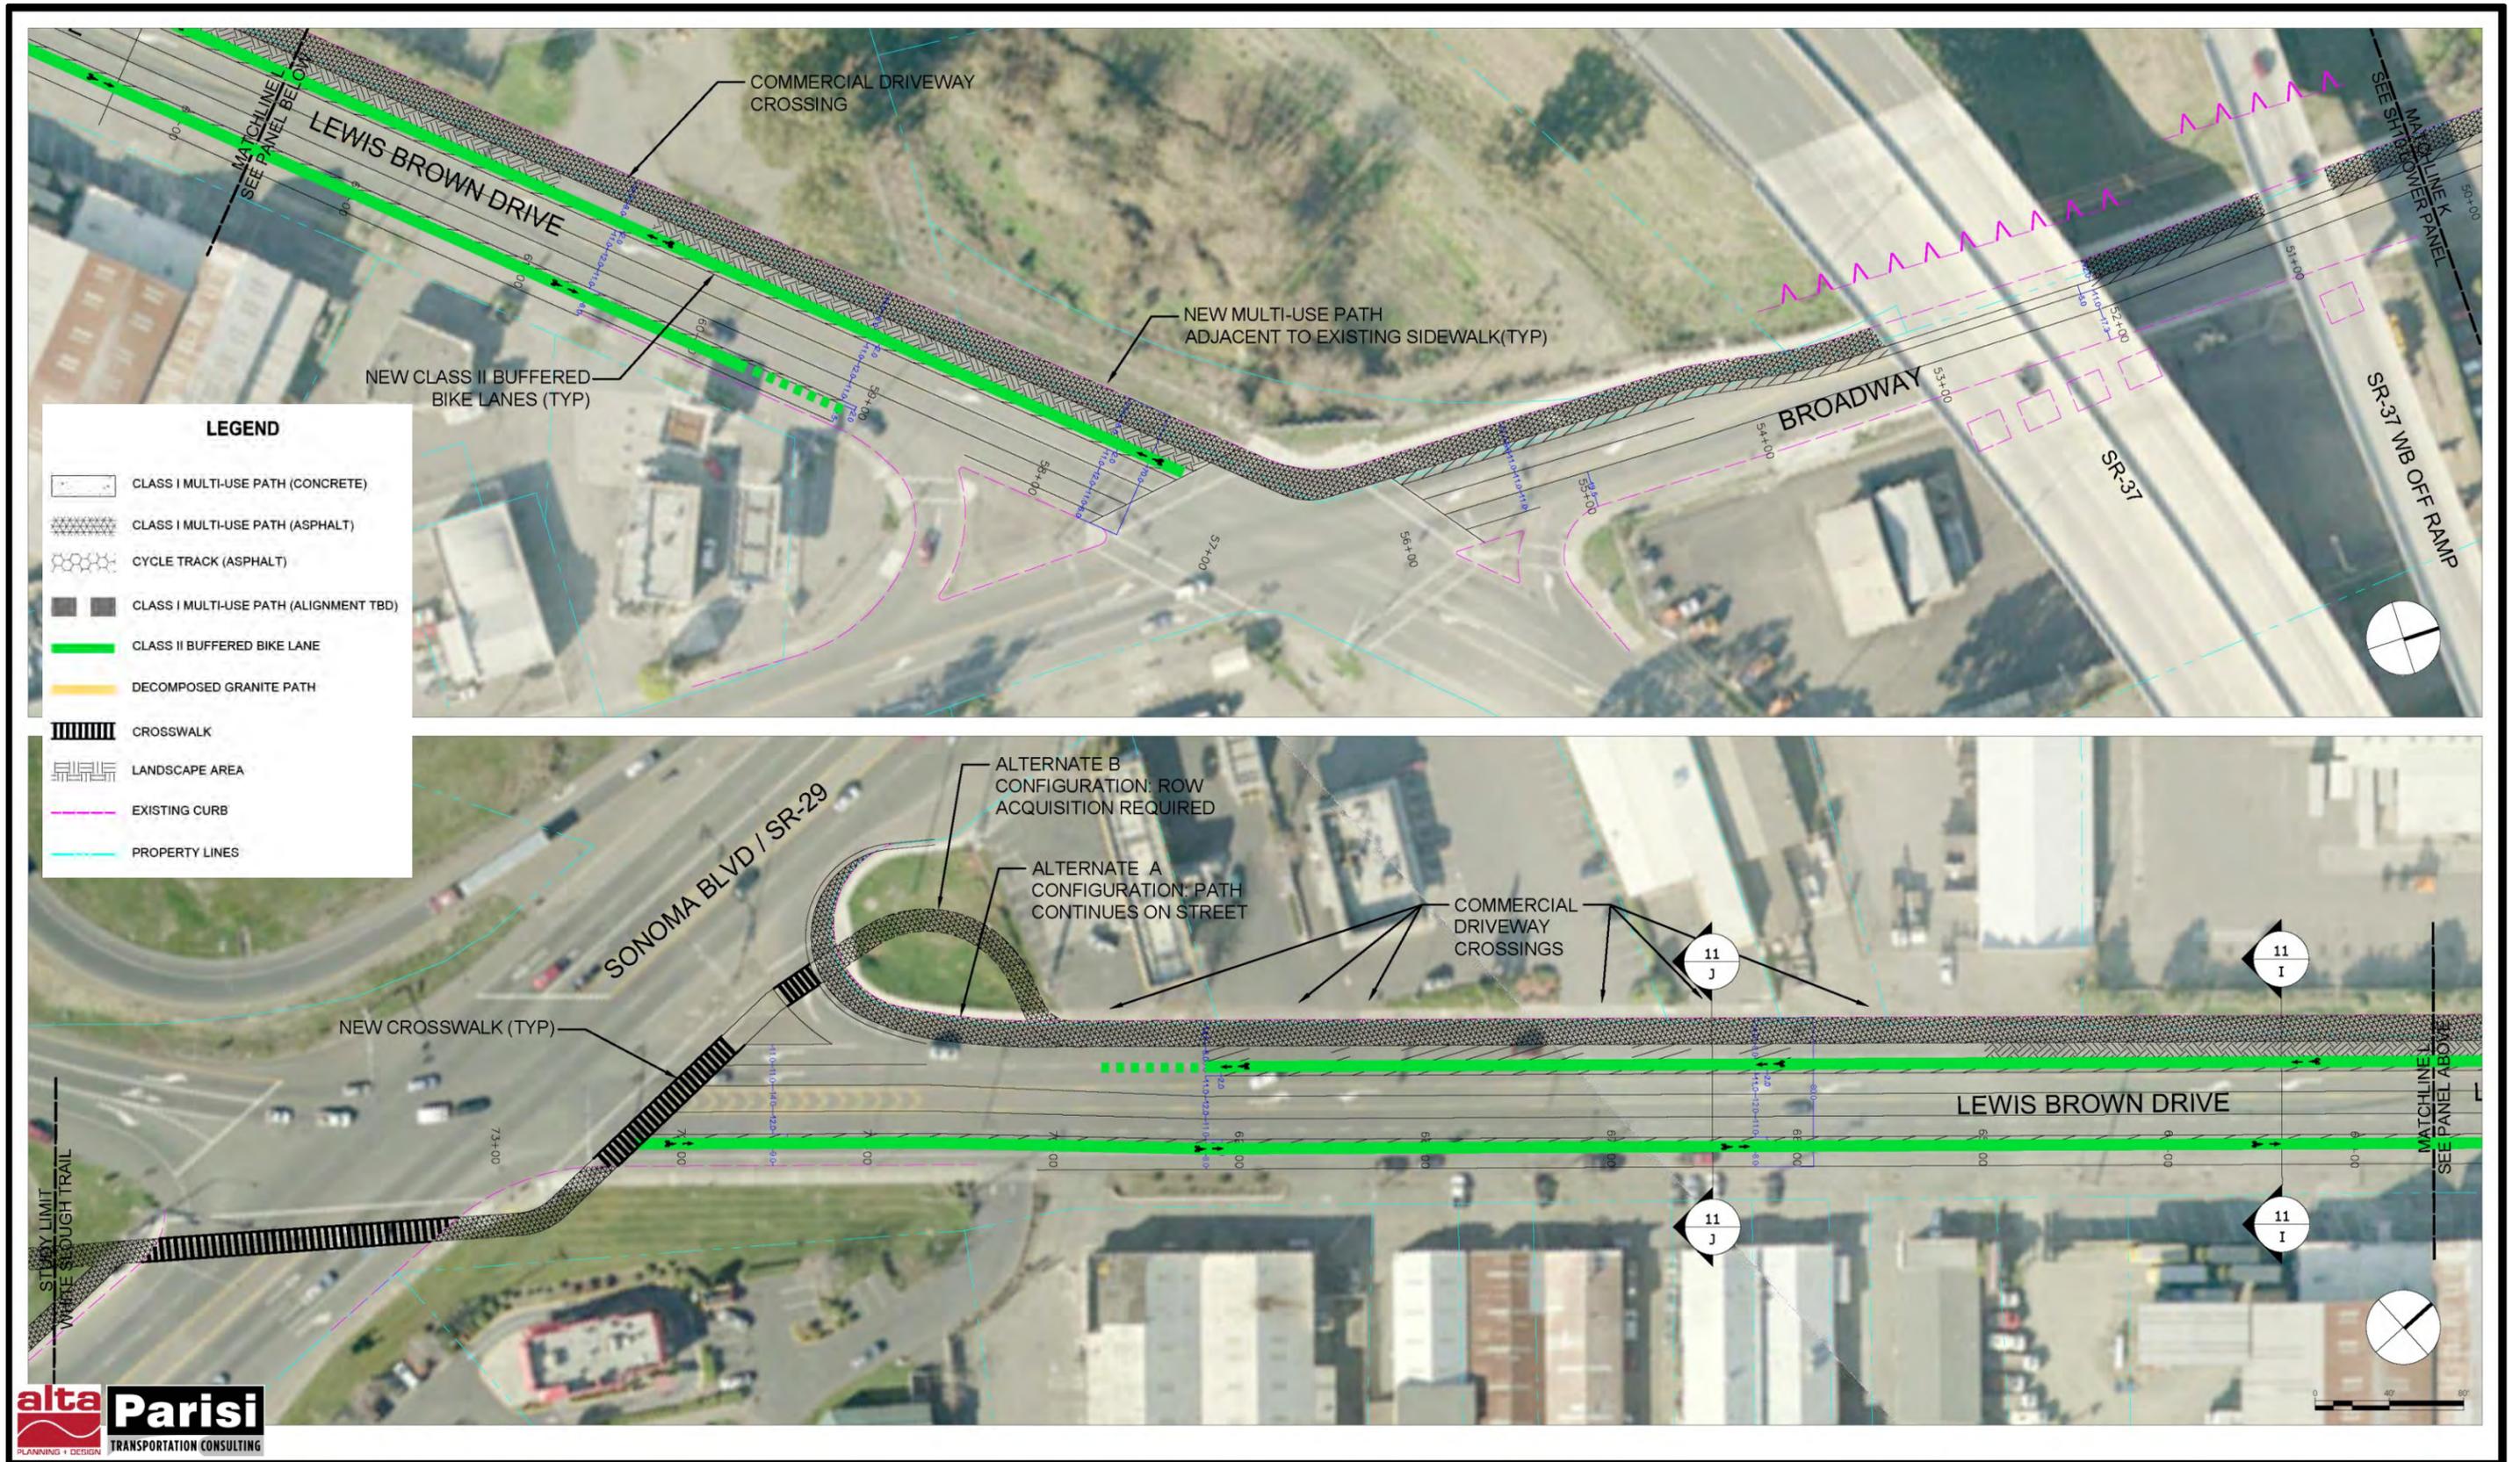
Segment 4 Detail Map (plan set sheet 11 of 13)
